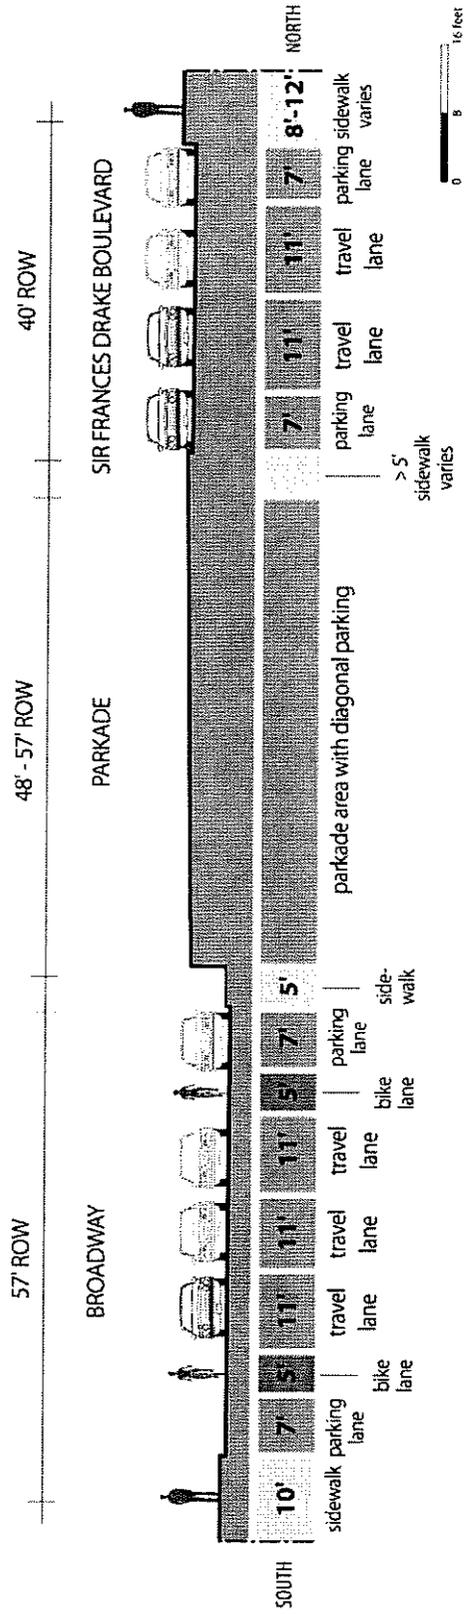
Section of Proposed Improvements for Project 6: Broadway Boulevard/Fairfax Parkade
